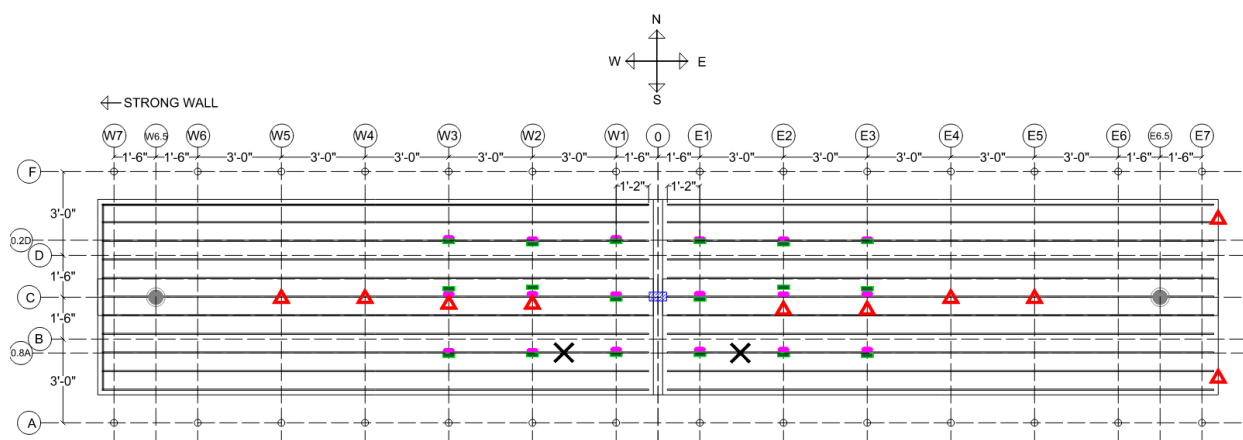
Concept B Instrumentation Plan (Plan View).
